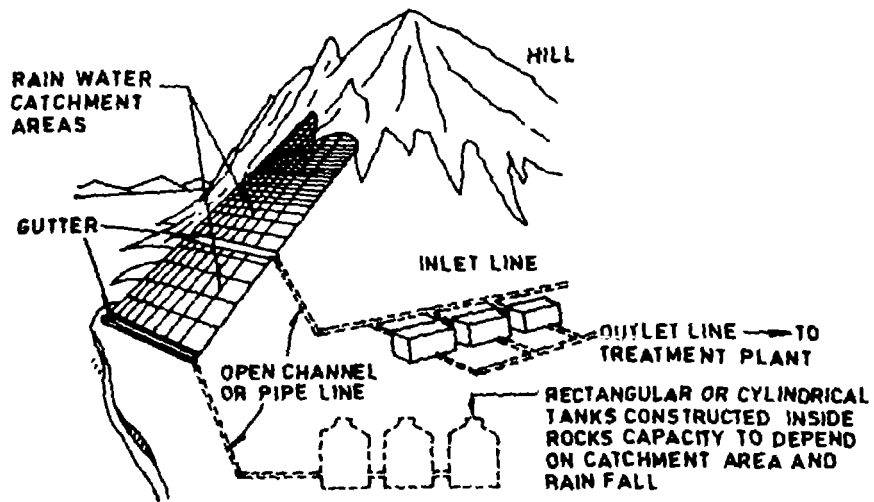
RAIN WATER COLLECTION THROUGH HILL SLOPES
